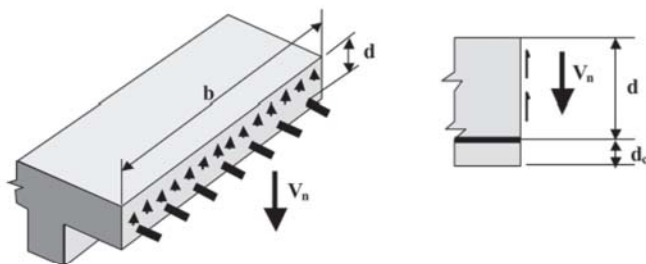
Contribution of concrete to beam-action shear strength in solid slabs.
